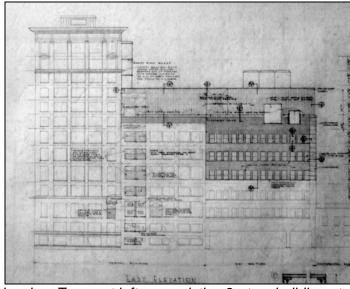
East elevation drawing: Tower at left, pre-existing 2-story building at right; at middle stand 1918 seven-story rear wing and 1948 addition, with 1956 upper-story addition (shaded). (Brooks Borg Skiles AE in Jacobsen: 13)
